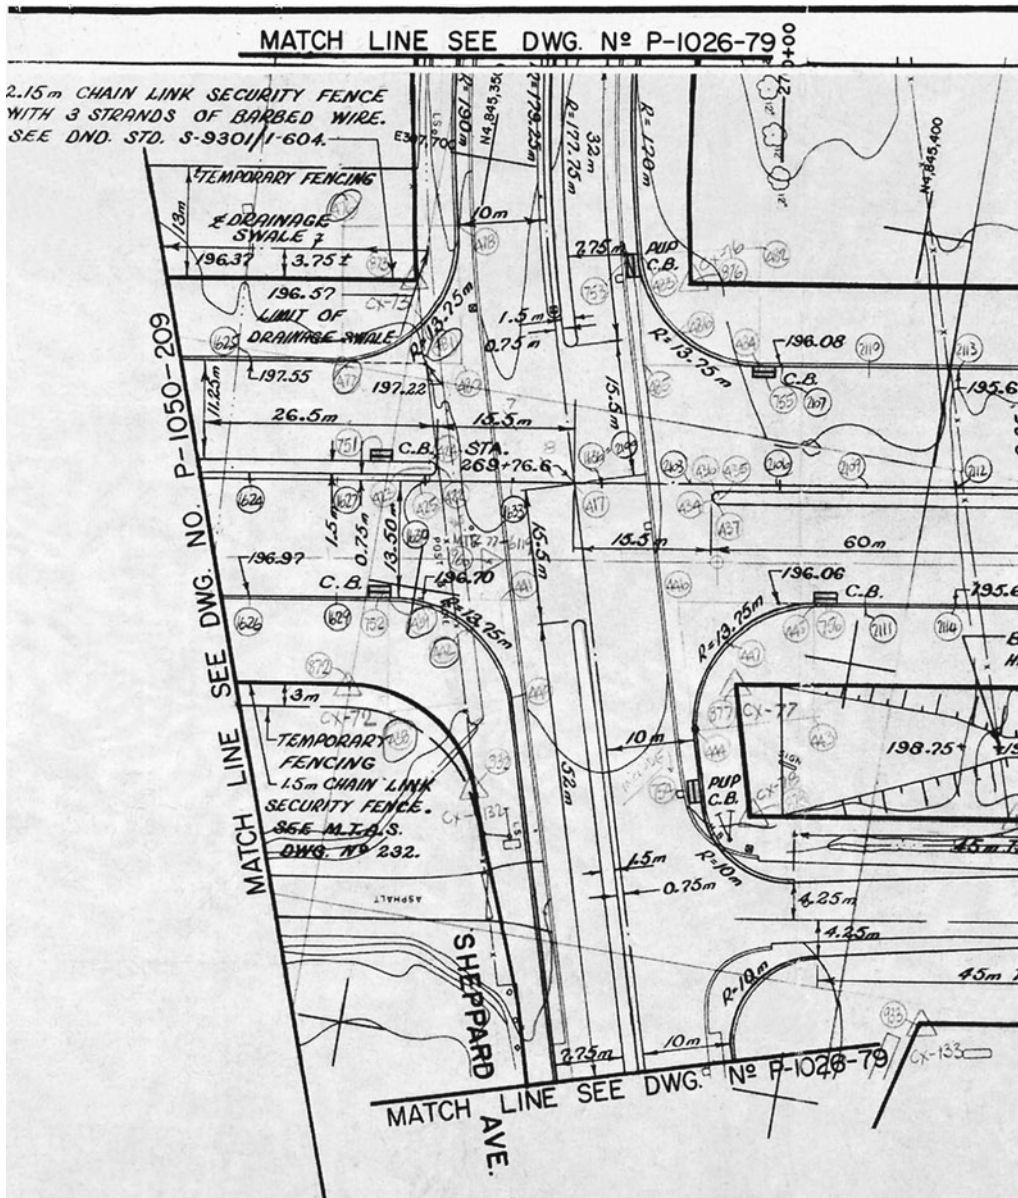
Portion of a construction plan showing layout points. (Courtesy of Department of Roads and Traffic, City of Toronto)
